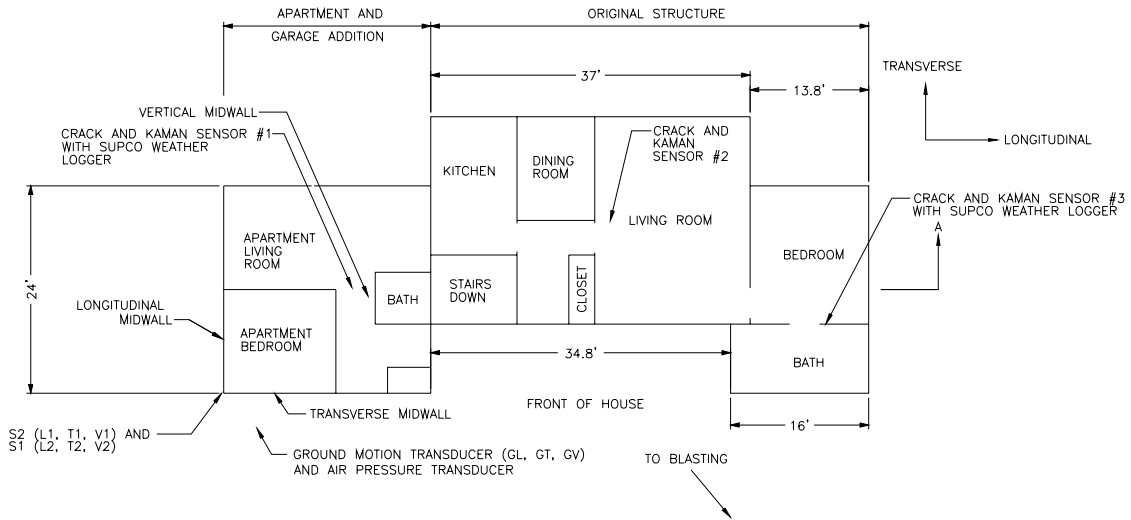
Plan View of Connecticut House with Crack and Sensor Locations
